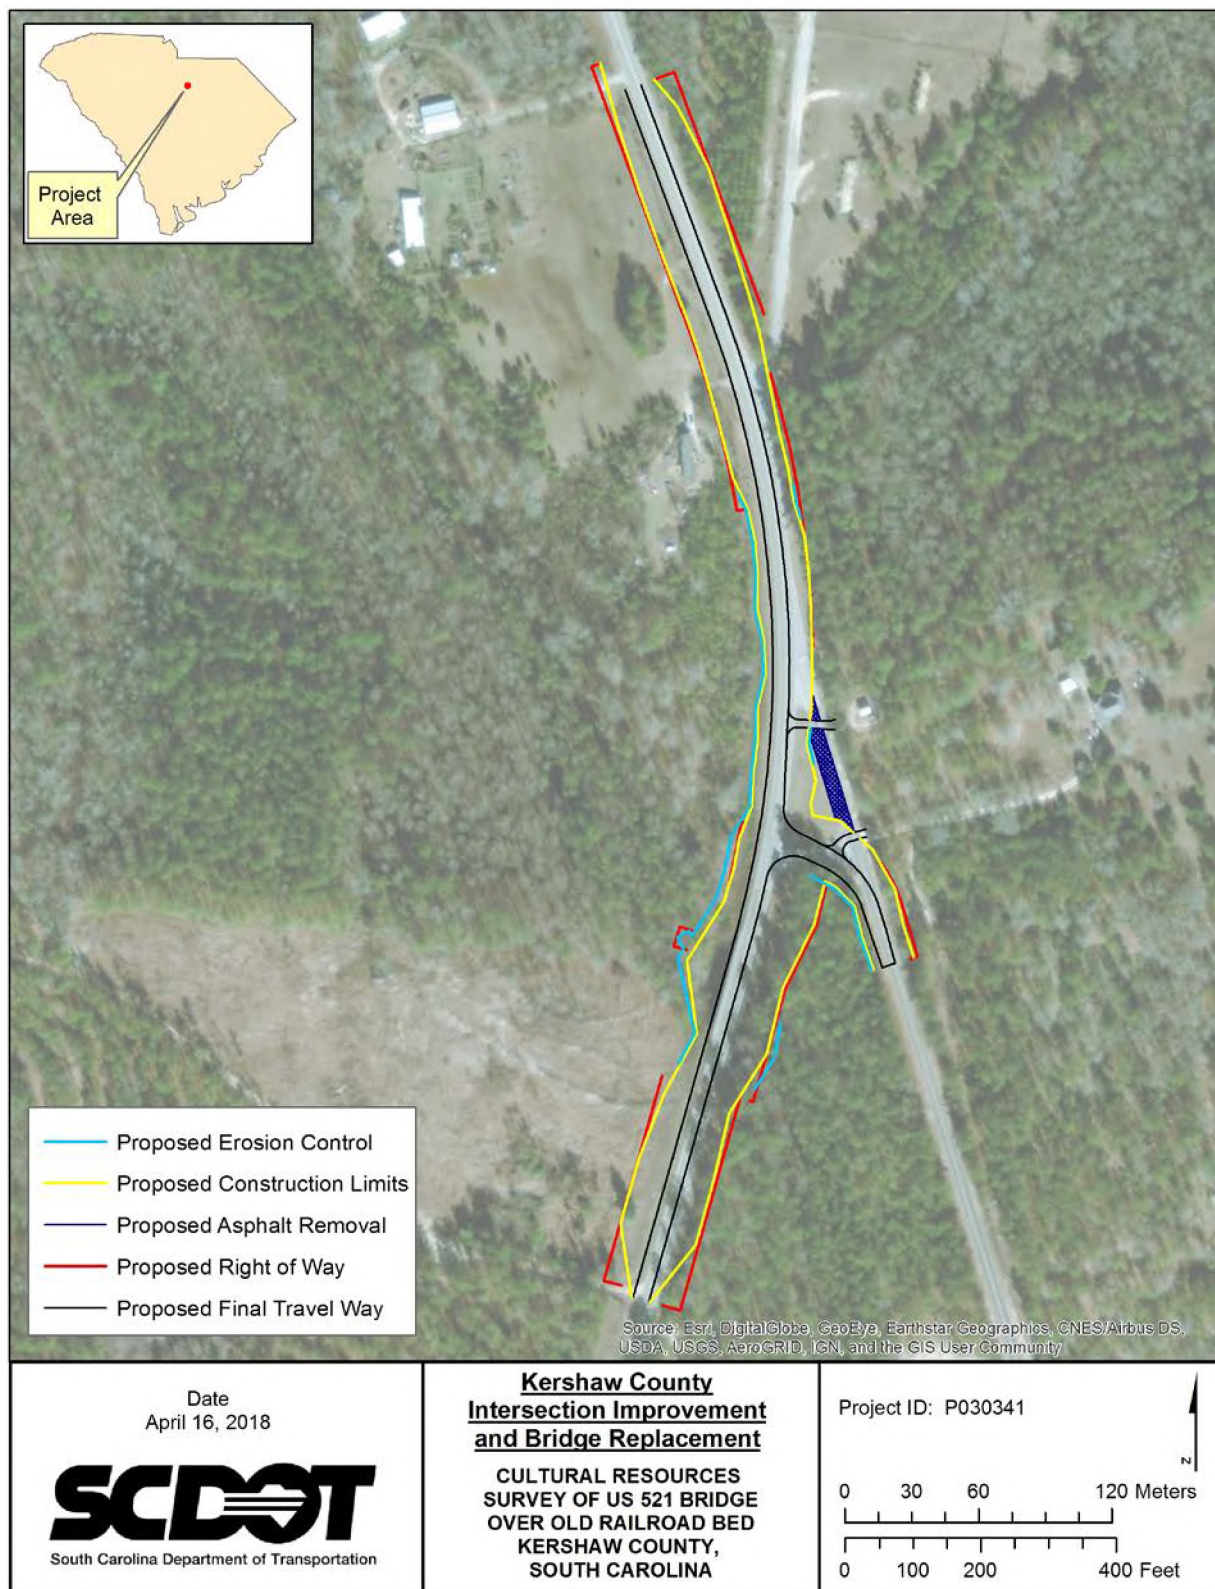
Intersection Improvement and Bridge Replacement Plans on US 521.
